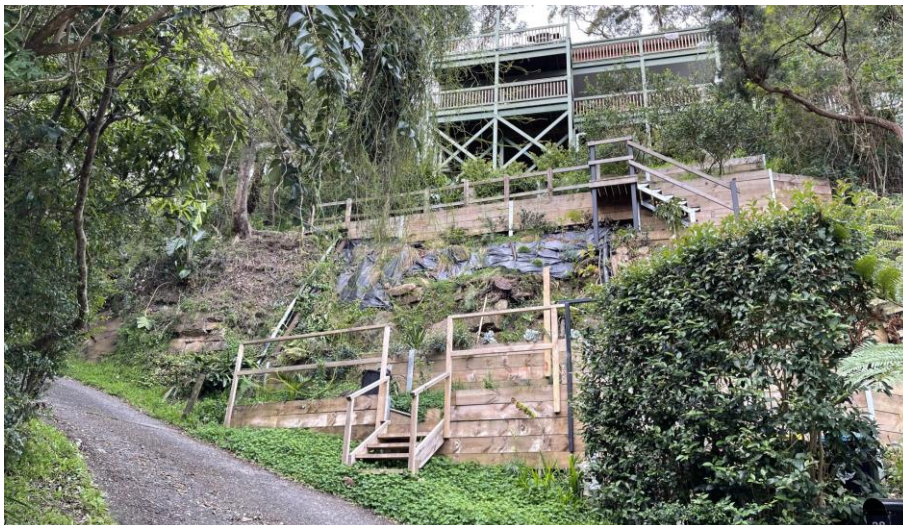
The subject site, looking north-east from Nareen Parade (prior to landslip)
